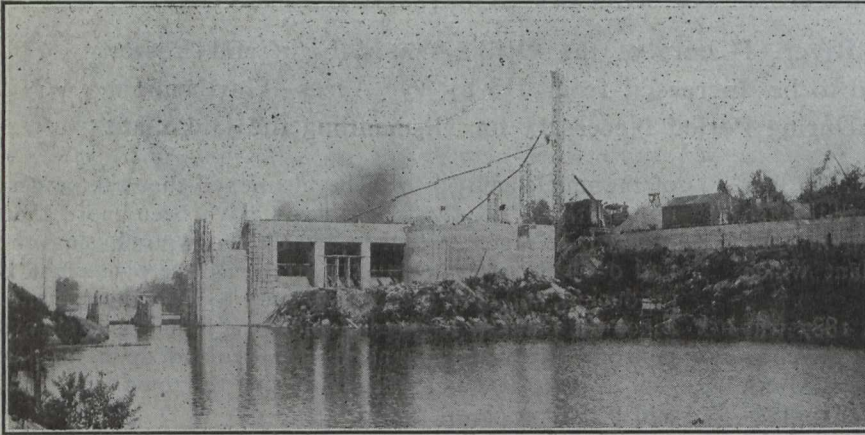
View Taken Looking Downstream, Showing Wheel-pit House, Entrance to Canal and Dam Partly Built
